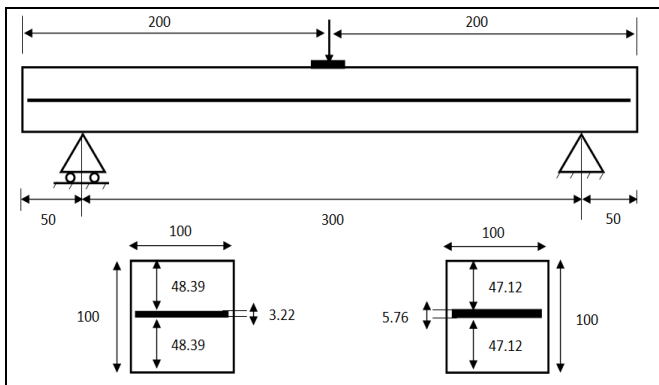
Test setup and specimens dimensions for the unreinforced and reinforced concrete beams.
